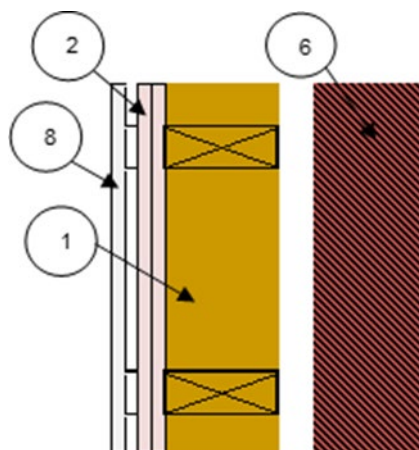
External brick wall (or equivalent) with timber framed wall incorporating non-fire grade lining and cladding – Section view
